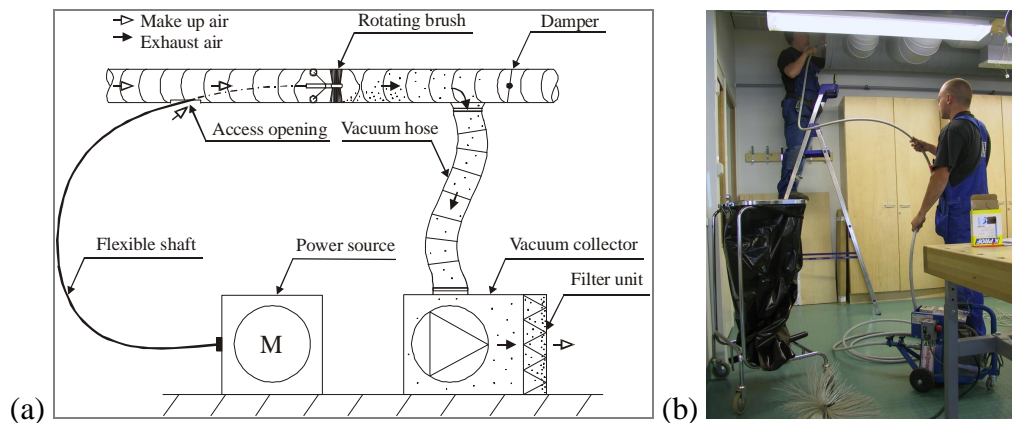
(a) A schematic picture of mechanical brushing with a vacuum collector. (b) Duct cleaning with mechanical brushing.
